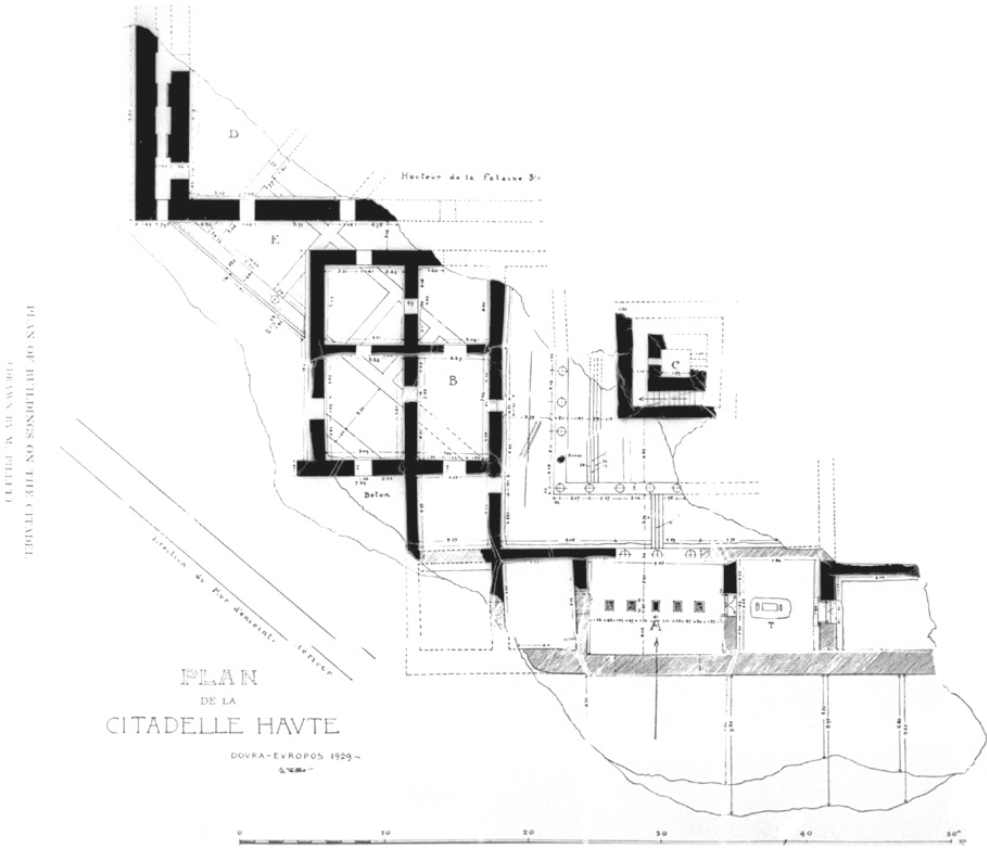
PLATE XLVII Plan of the citadel palace, Dura-Europos, after M. Pillet.
